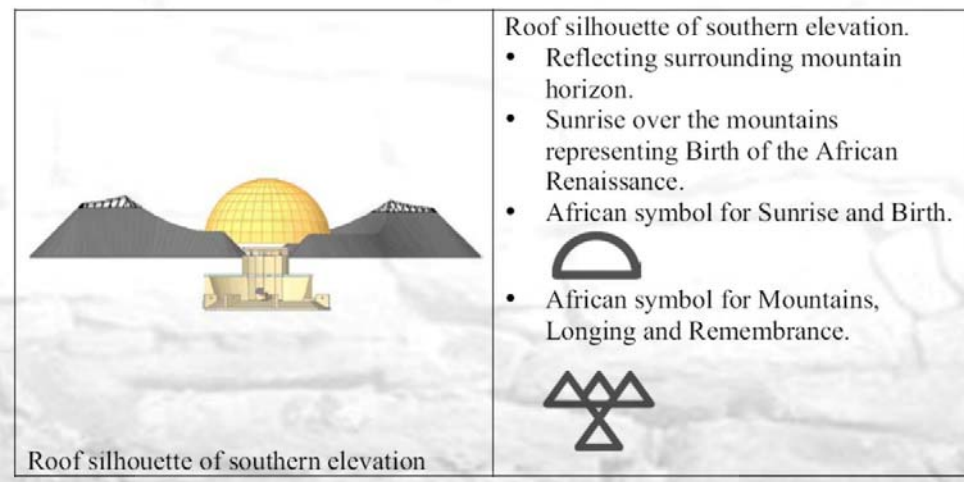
roof silhouette, roof shapes, Kouga cultural centre
